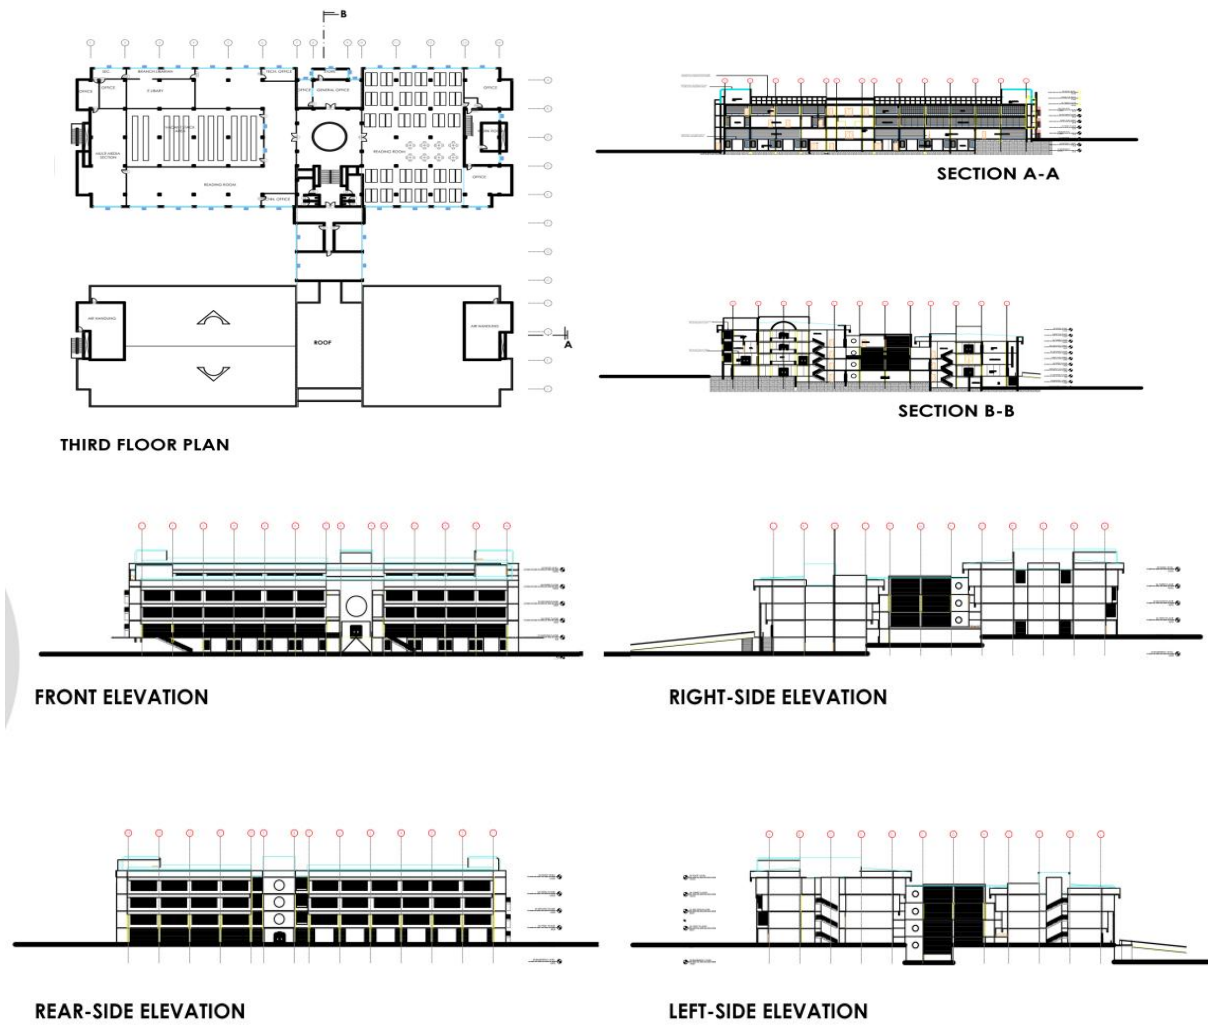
Floor, Elevations and Section plans of Obafemi Awolowo University
